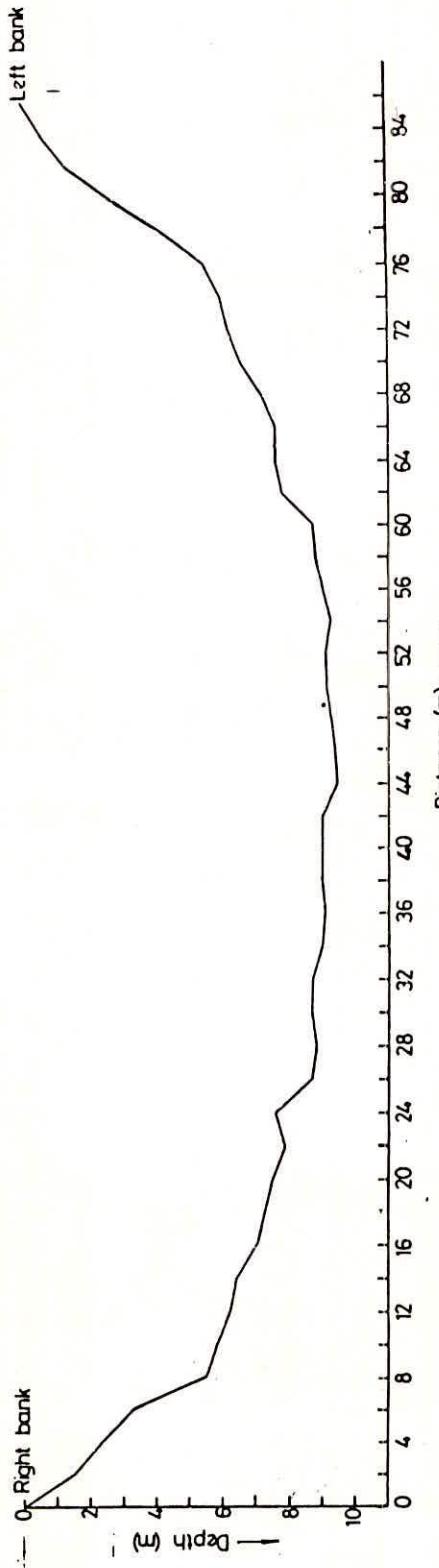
CROSS-SECTION OF RIVER CHITRAVATI AT ADAKUR ROAD BRIDGE
